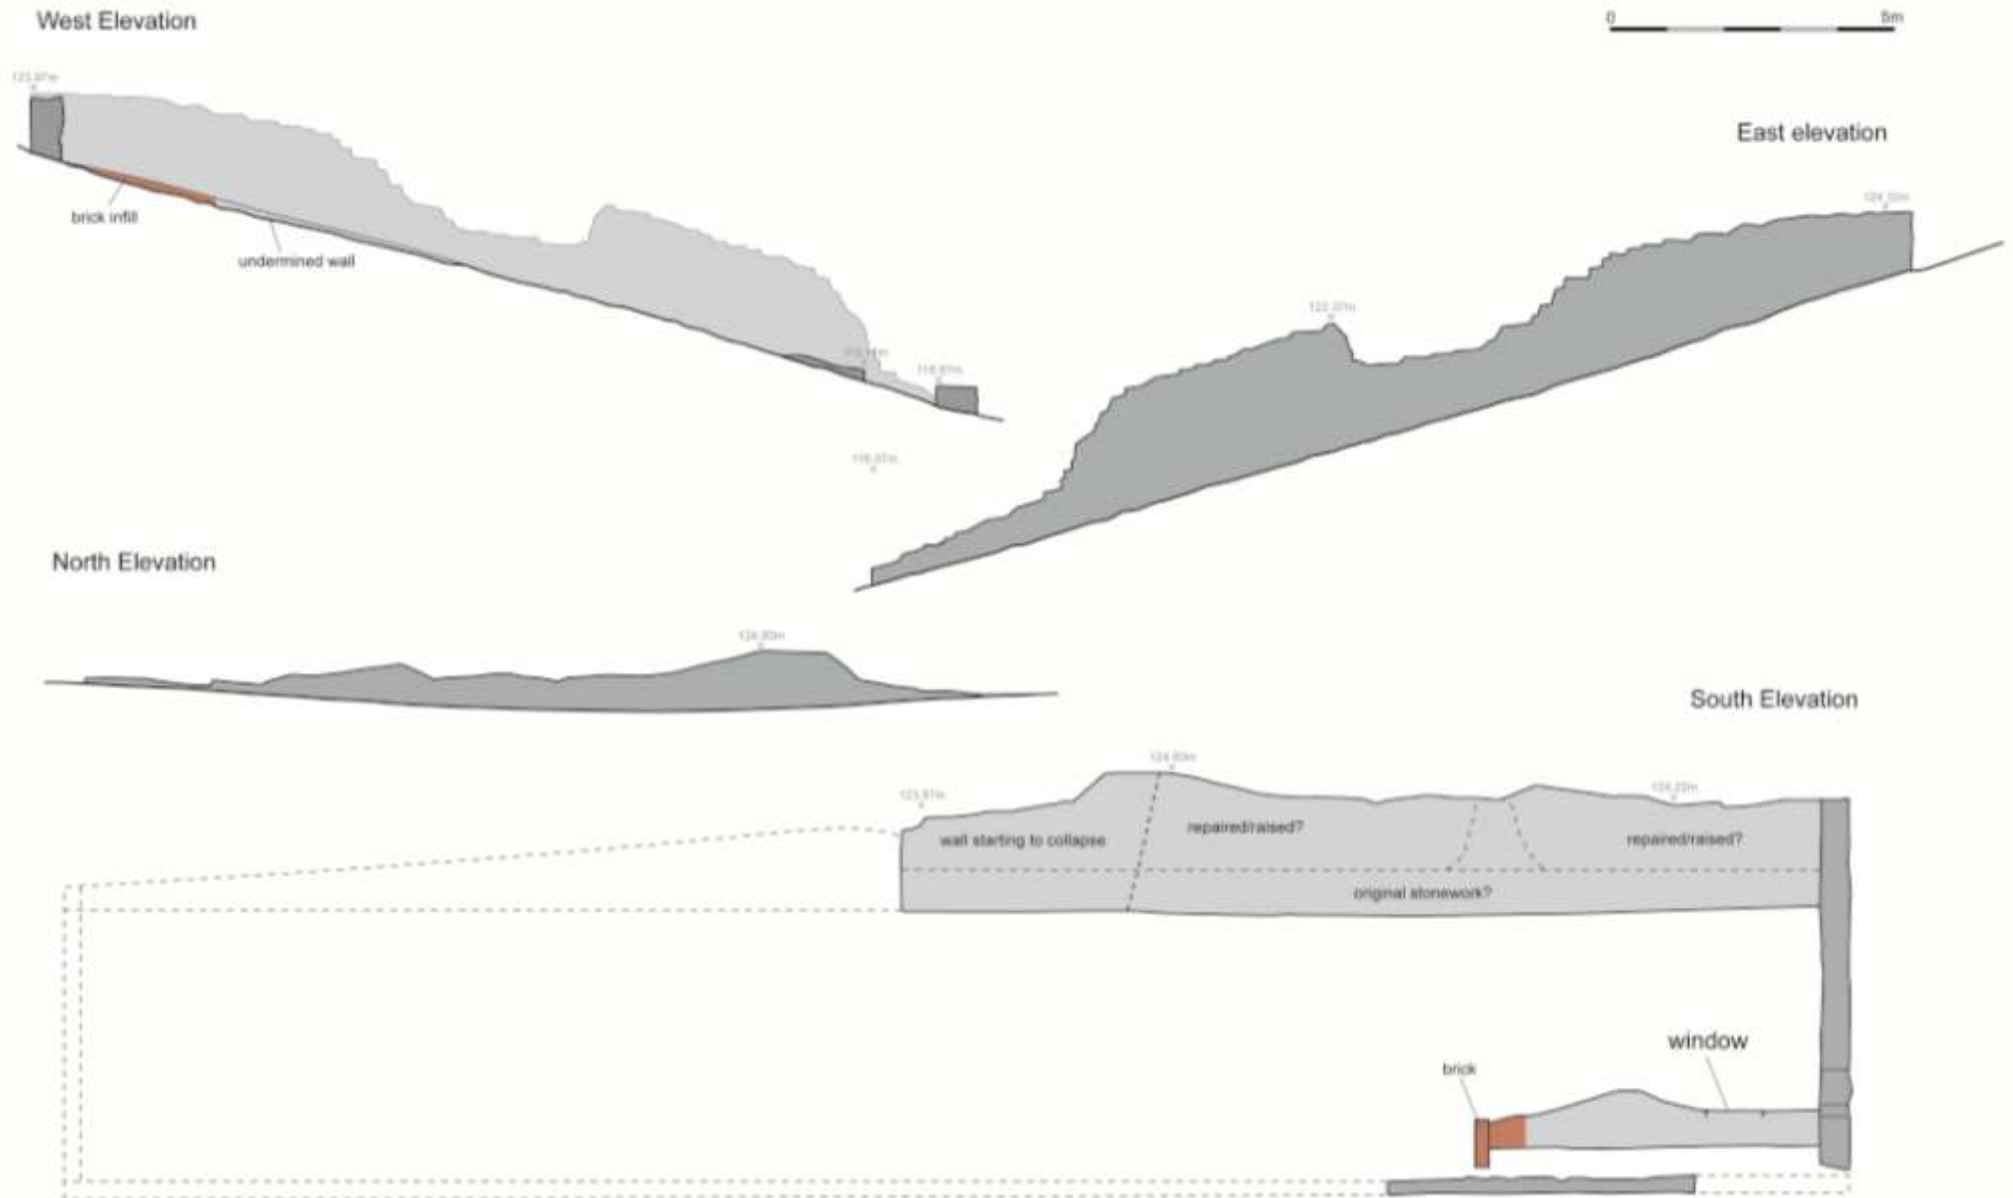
Drawings of surviving the elevations (measured elevations supplied by the architect).
